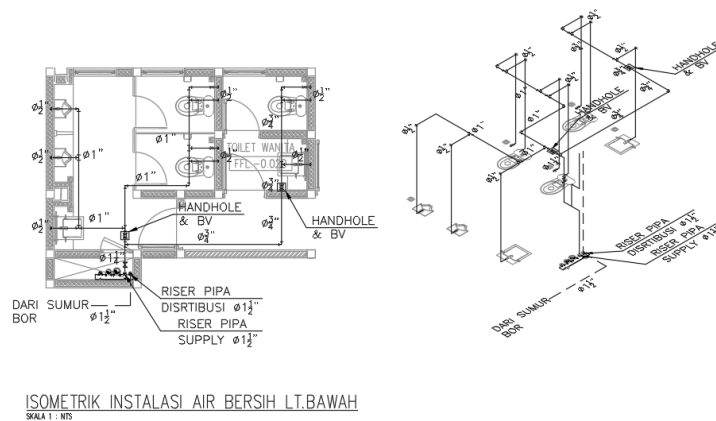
First Floor Clean Water Pipe Line Installation Plan
